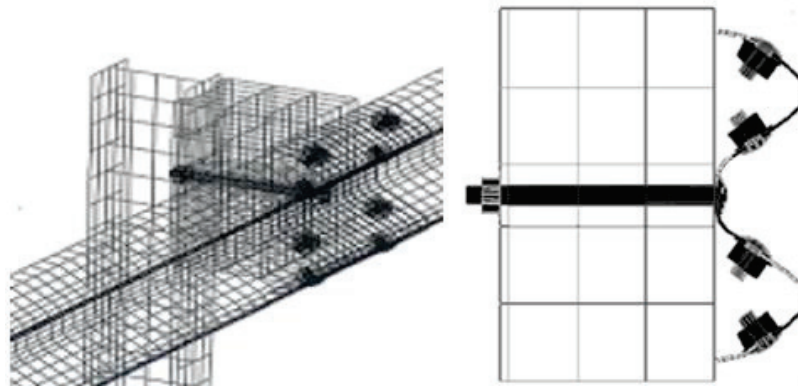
16 Detailed modeling of bolts connection of safety barrier [19]
